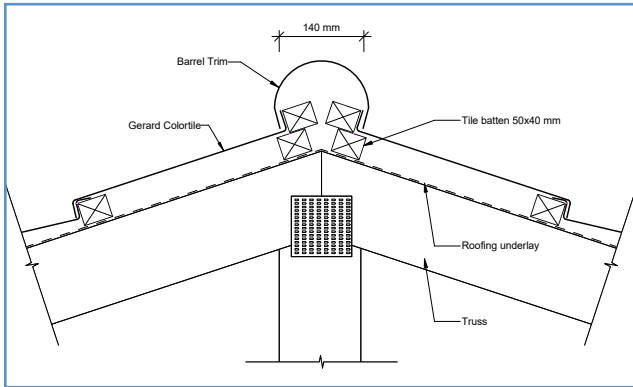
Barrel 150 trim on truss ridge
